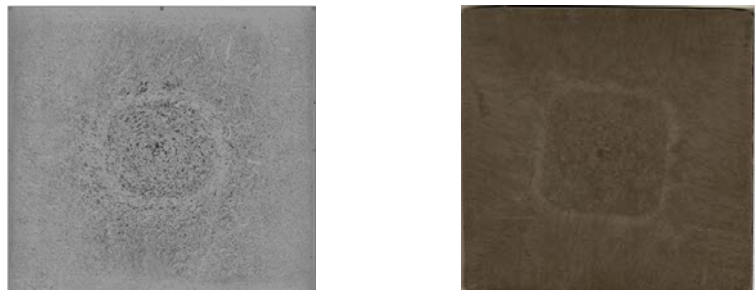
Wedge induced cracks in a slab specimen (slab thickness 210 mm).
